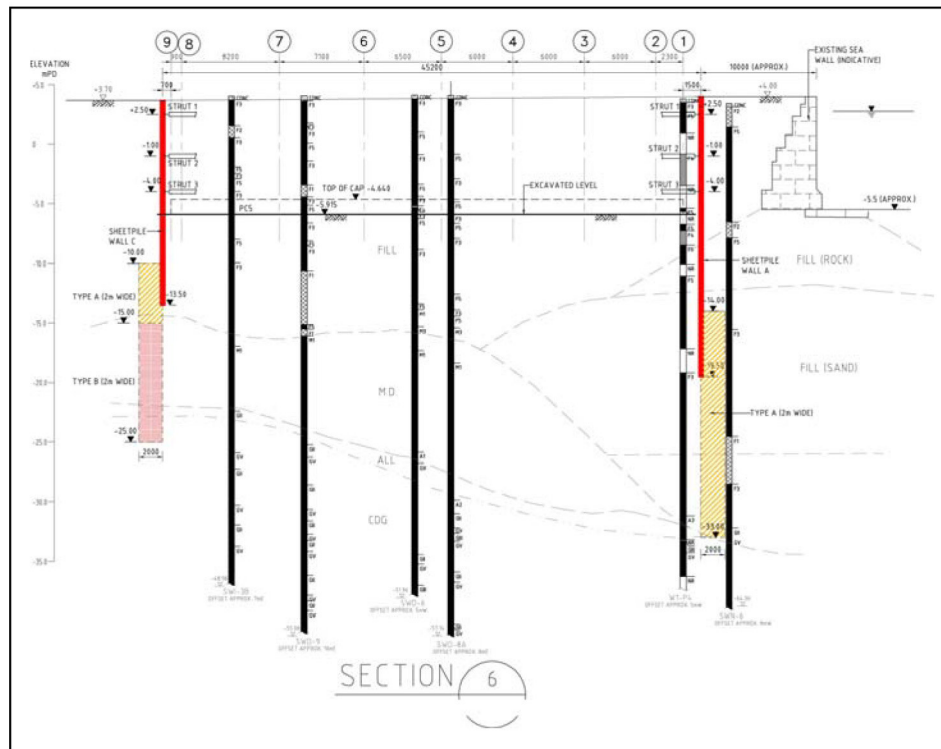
North-South Cross-section of the Sheetpile Cofferdam
